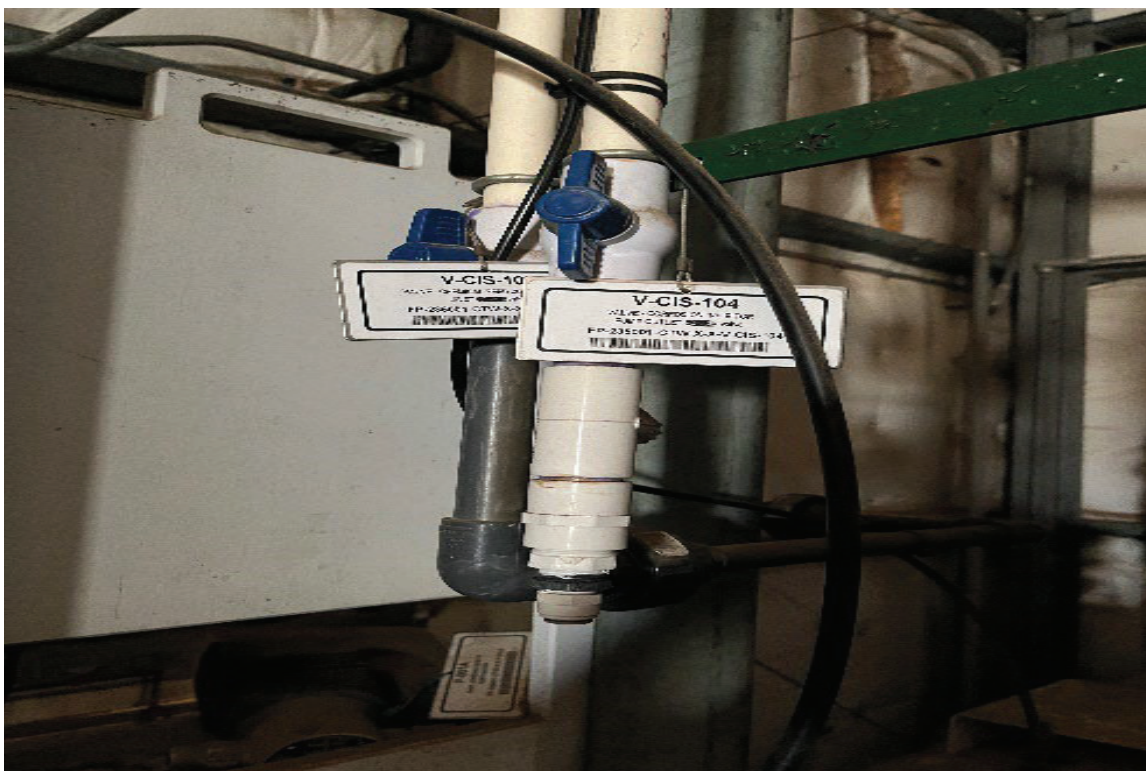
Interior of Building 235-1F – Chemical treatment inlet.
